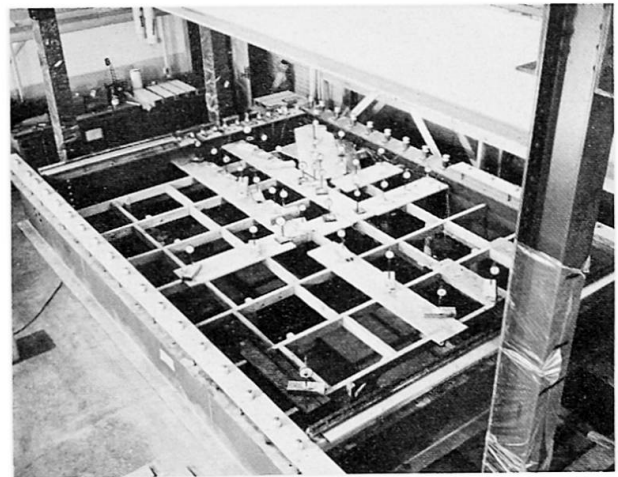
Support and deflection dial arrangement for full-scale slab tests.
